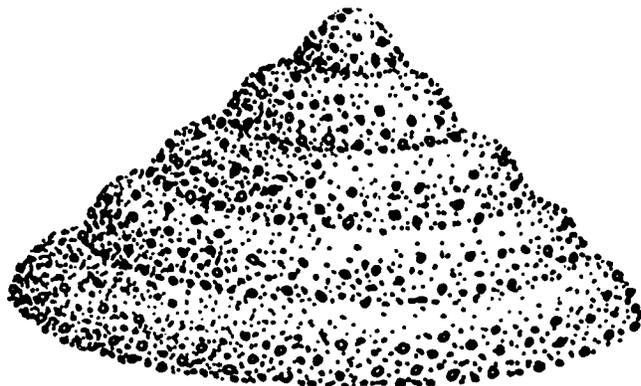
Layered stockpile (*Asphalt Institute*).
